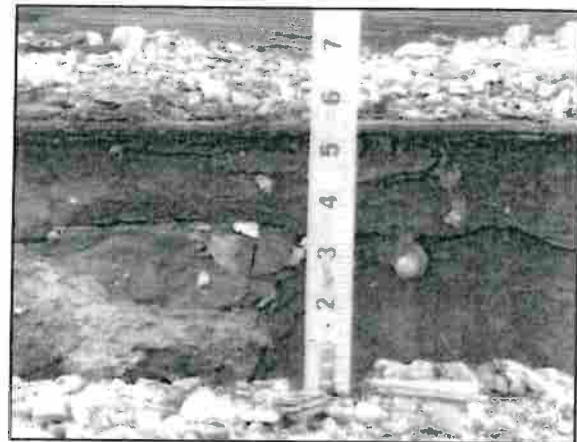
Approximately 5 inches of settlement at the back of the sheet pile wall.
